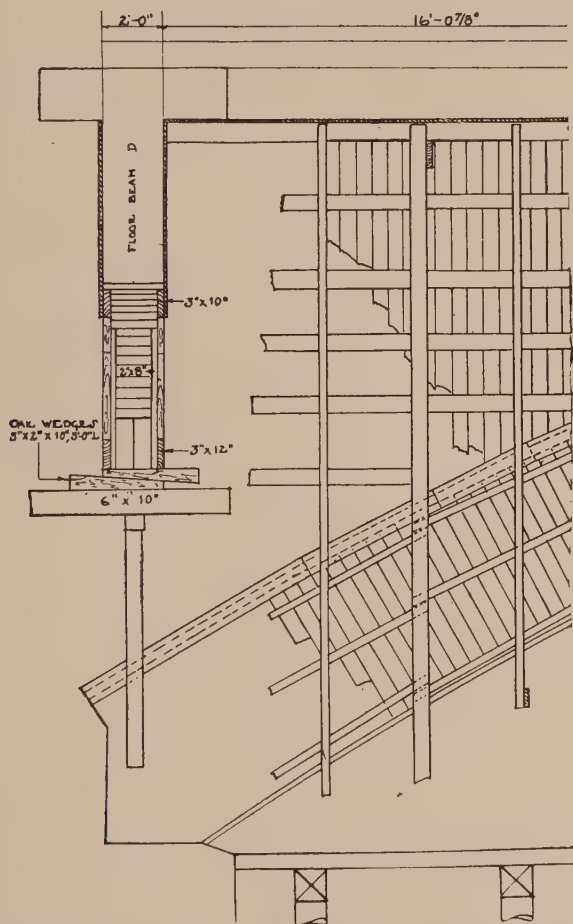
Shows portion of half elevation of arch centering for interior of arch ring in the 122 ft. span of the Charles River bridge—Boston Elevated Company, illustrated in Fig. 223. (See Figs. 224a, b and c for complete view.)
